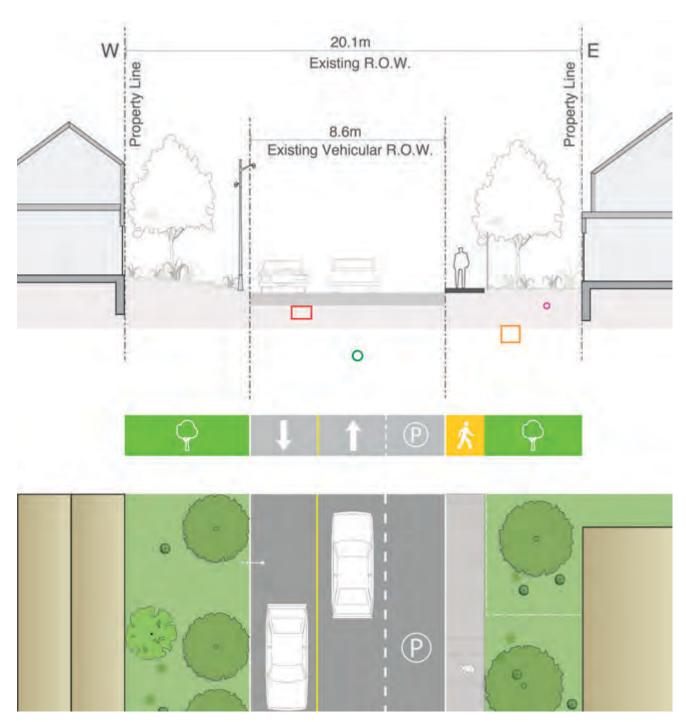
Section and Plan of the Existing Conditions along Redpath Avenue from Manor Road East to Soudan Avenue
